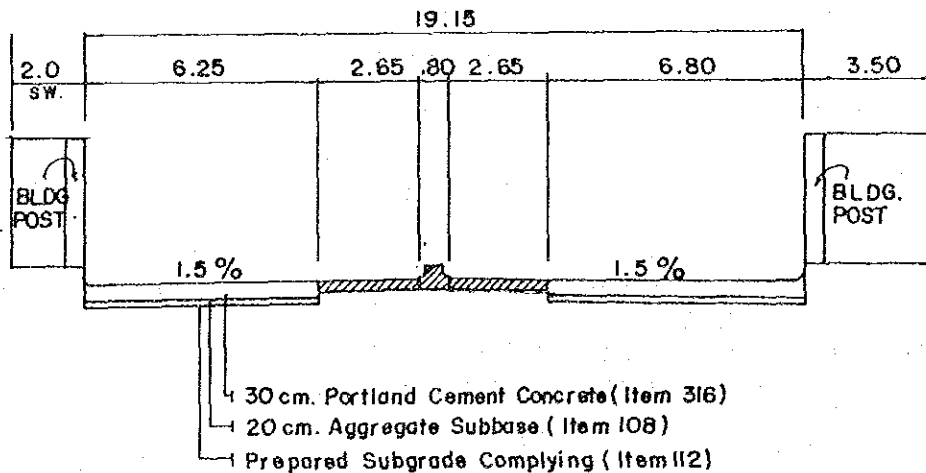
PROPOSED IMPROVEMENT: URBAN SECTION OF SAN JOSE CITY
